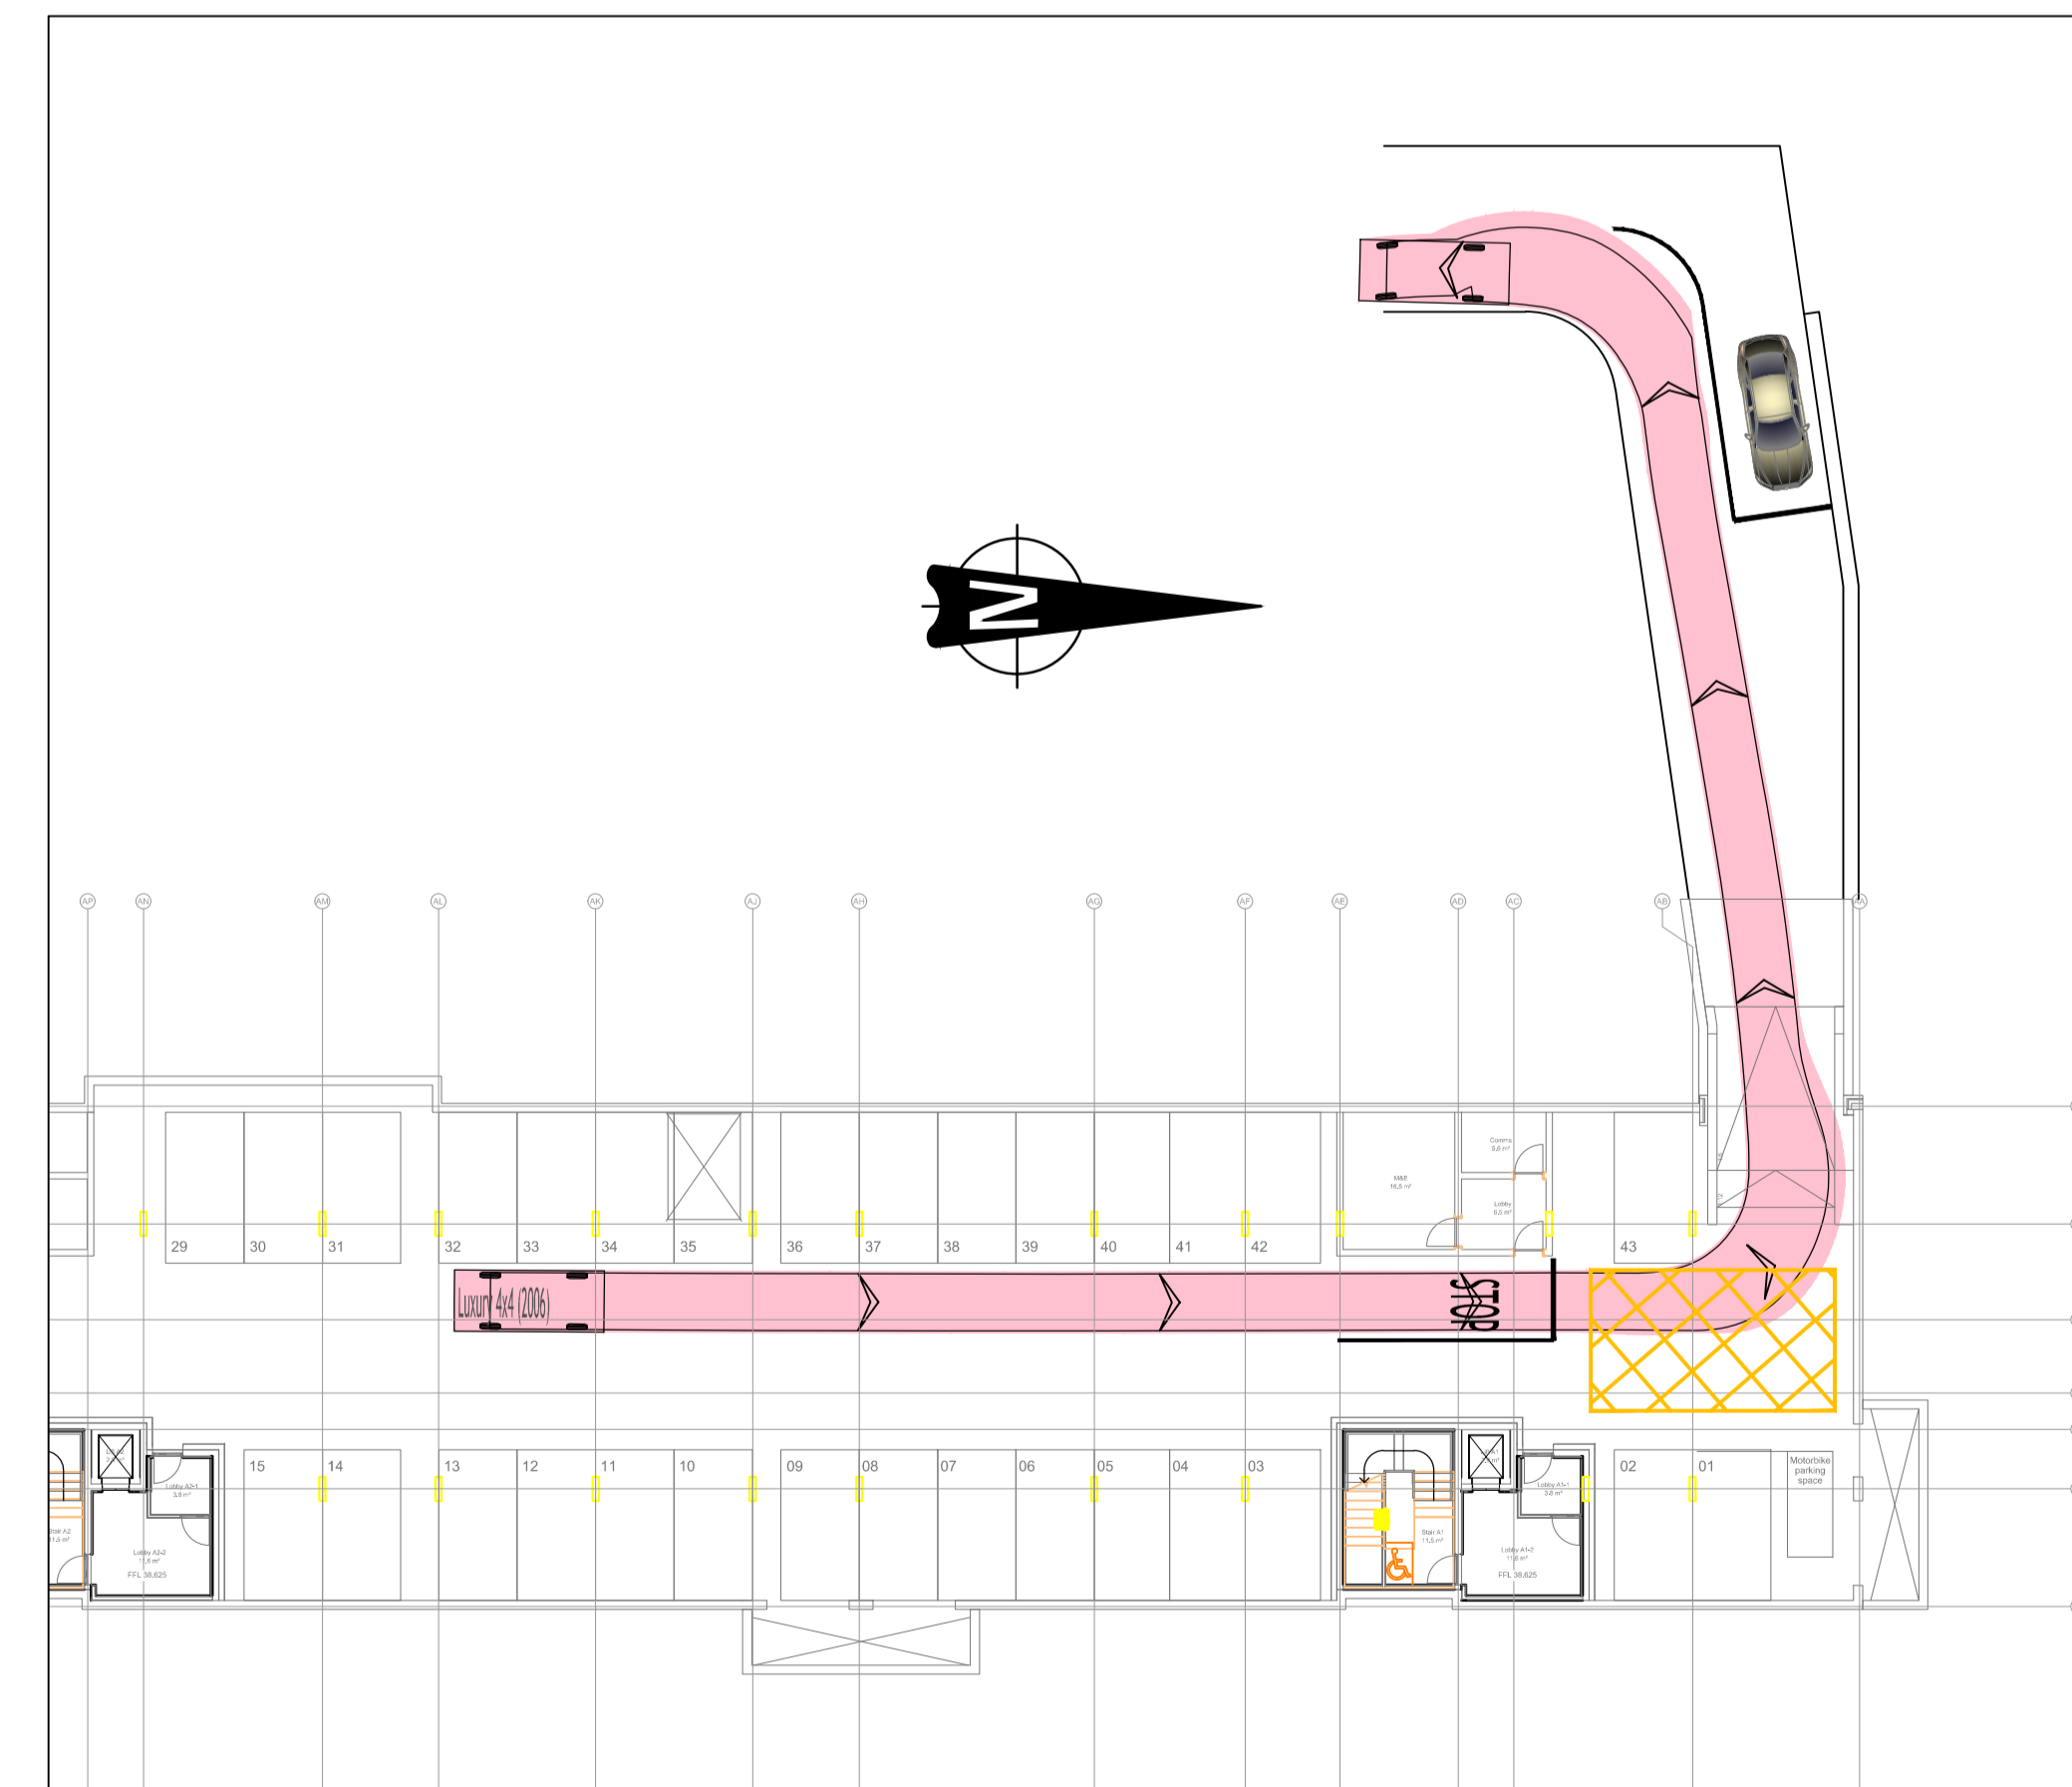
PRIVATE CAR EXITING PARKING BAY 42
